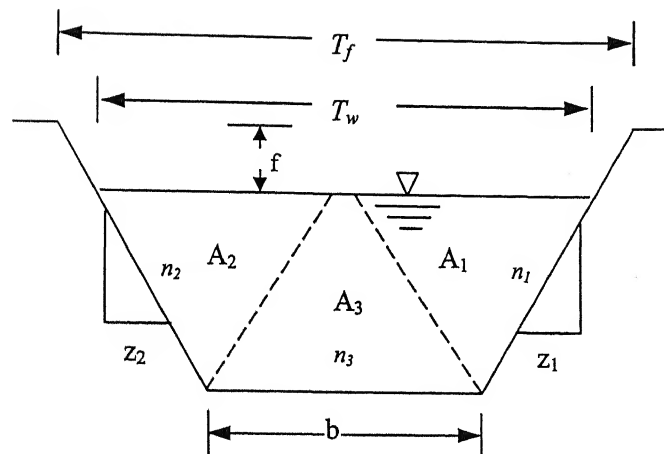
Trapezoidal channel section with bisecting lines of angle
